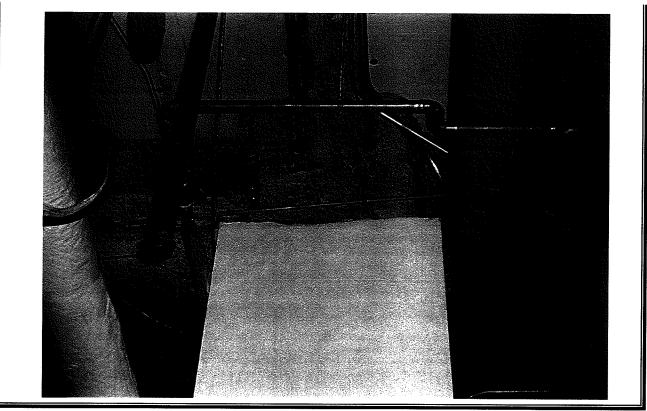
Photo Date 11/21/06 View of spray-on fireproofing on ceiling beams exposed at the Midtown Tower Central HVAC Plant. The fire proofing contains friable asbestos containing materials.
